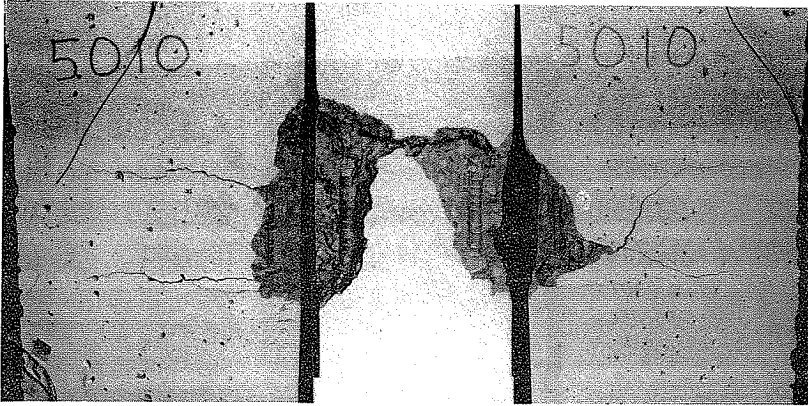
Failure of S.B.-specimen No. 50/10.
